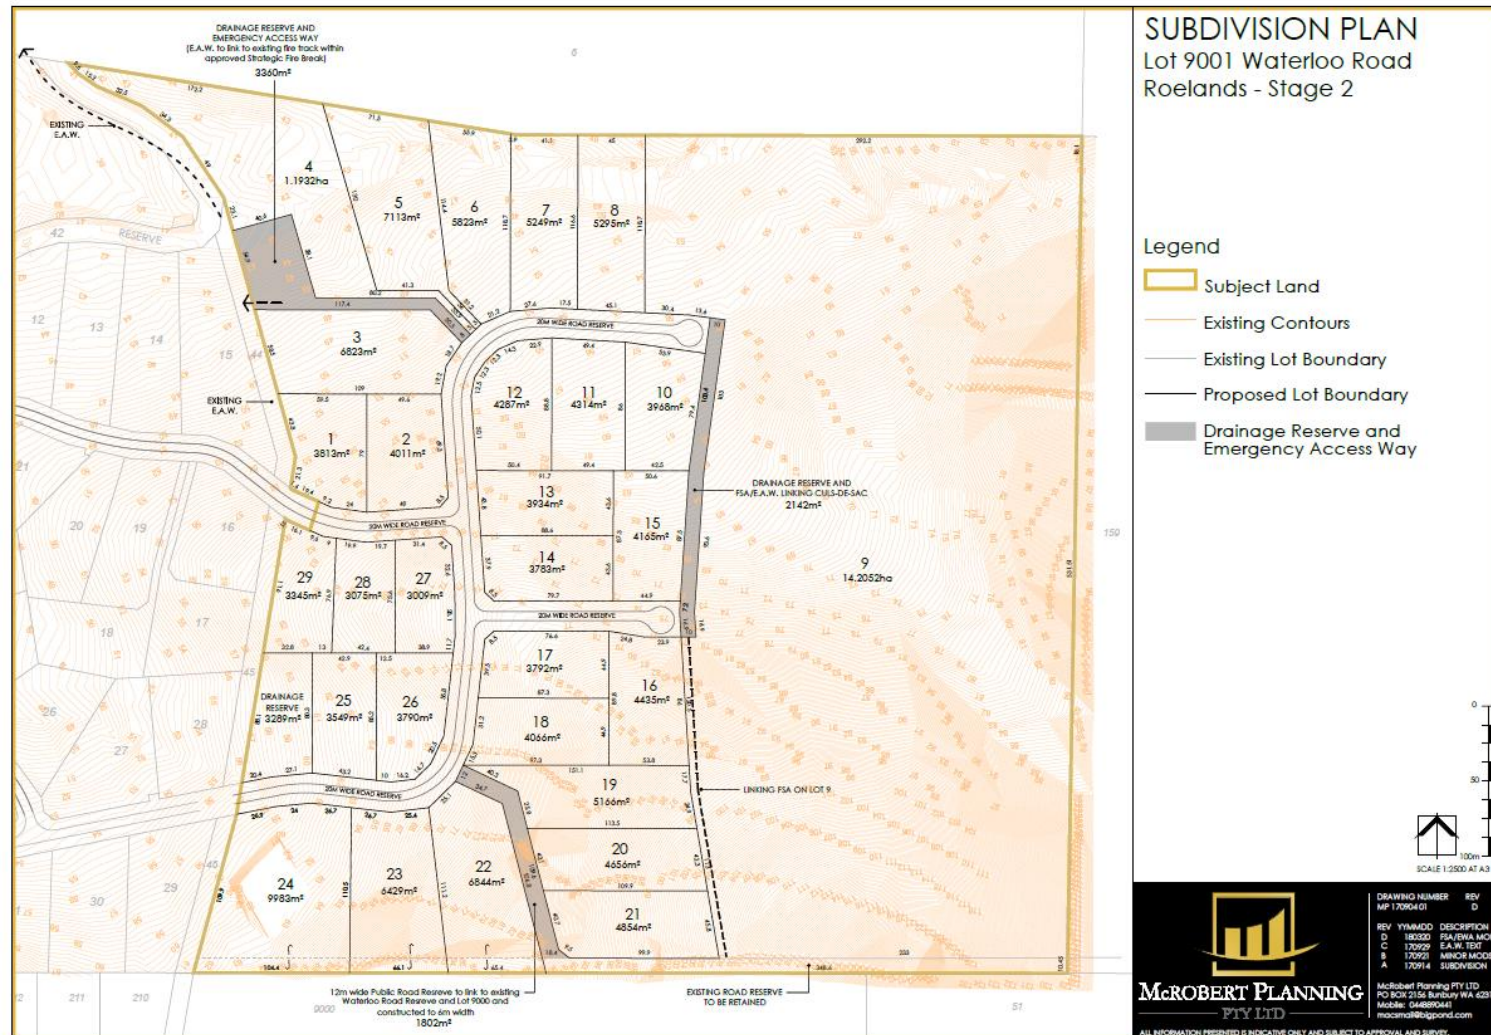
Plan of Subdivision Stage 2 Heritage Hills
